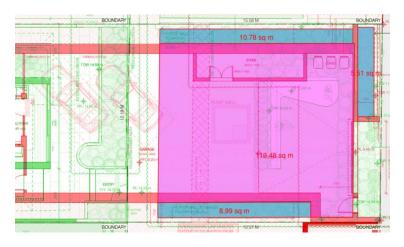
Proposed ground floor plan (in red) of the Torrens section of the site overlay basement level (in green), with Council markings of DSPA (in blue) and those DSPA not counted (in pink) - 8 Victory Street, Clovelly (BJB Architects Pty Ltd)
